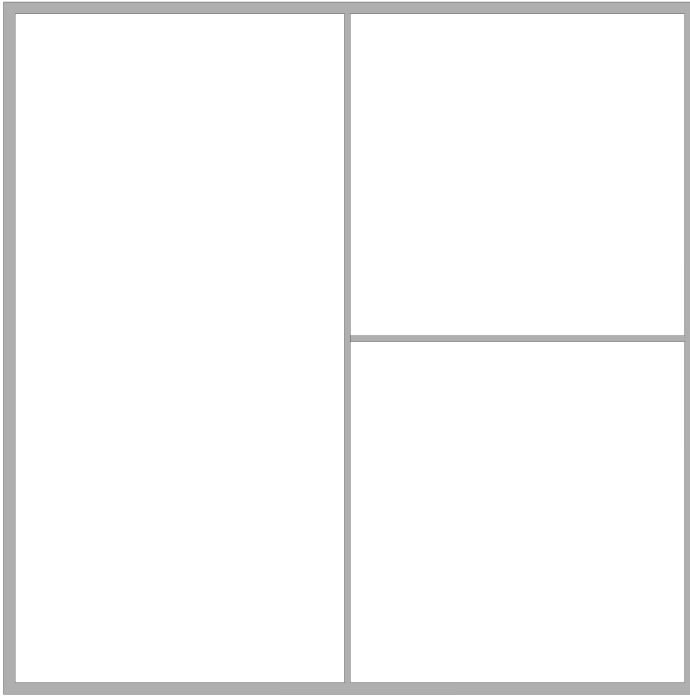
Floor plan of a building with three rooms: the drawing consists of just the walls but the rooms are instantly recognizable
